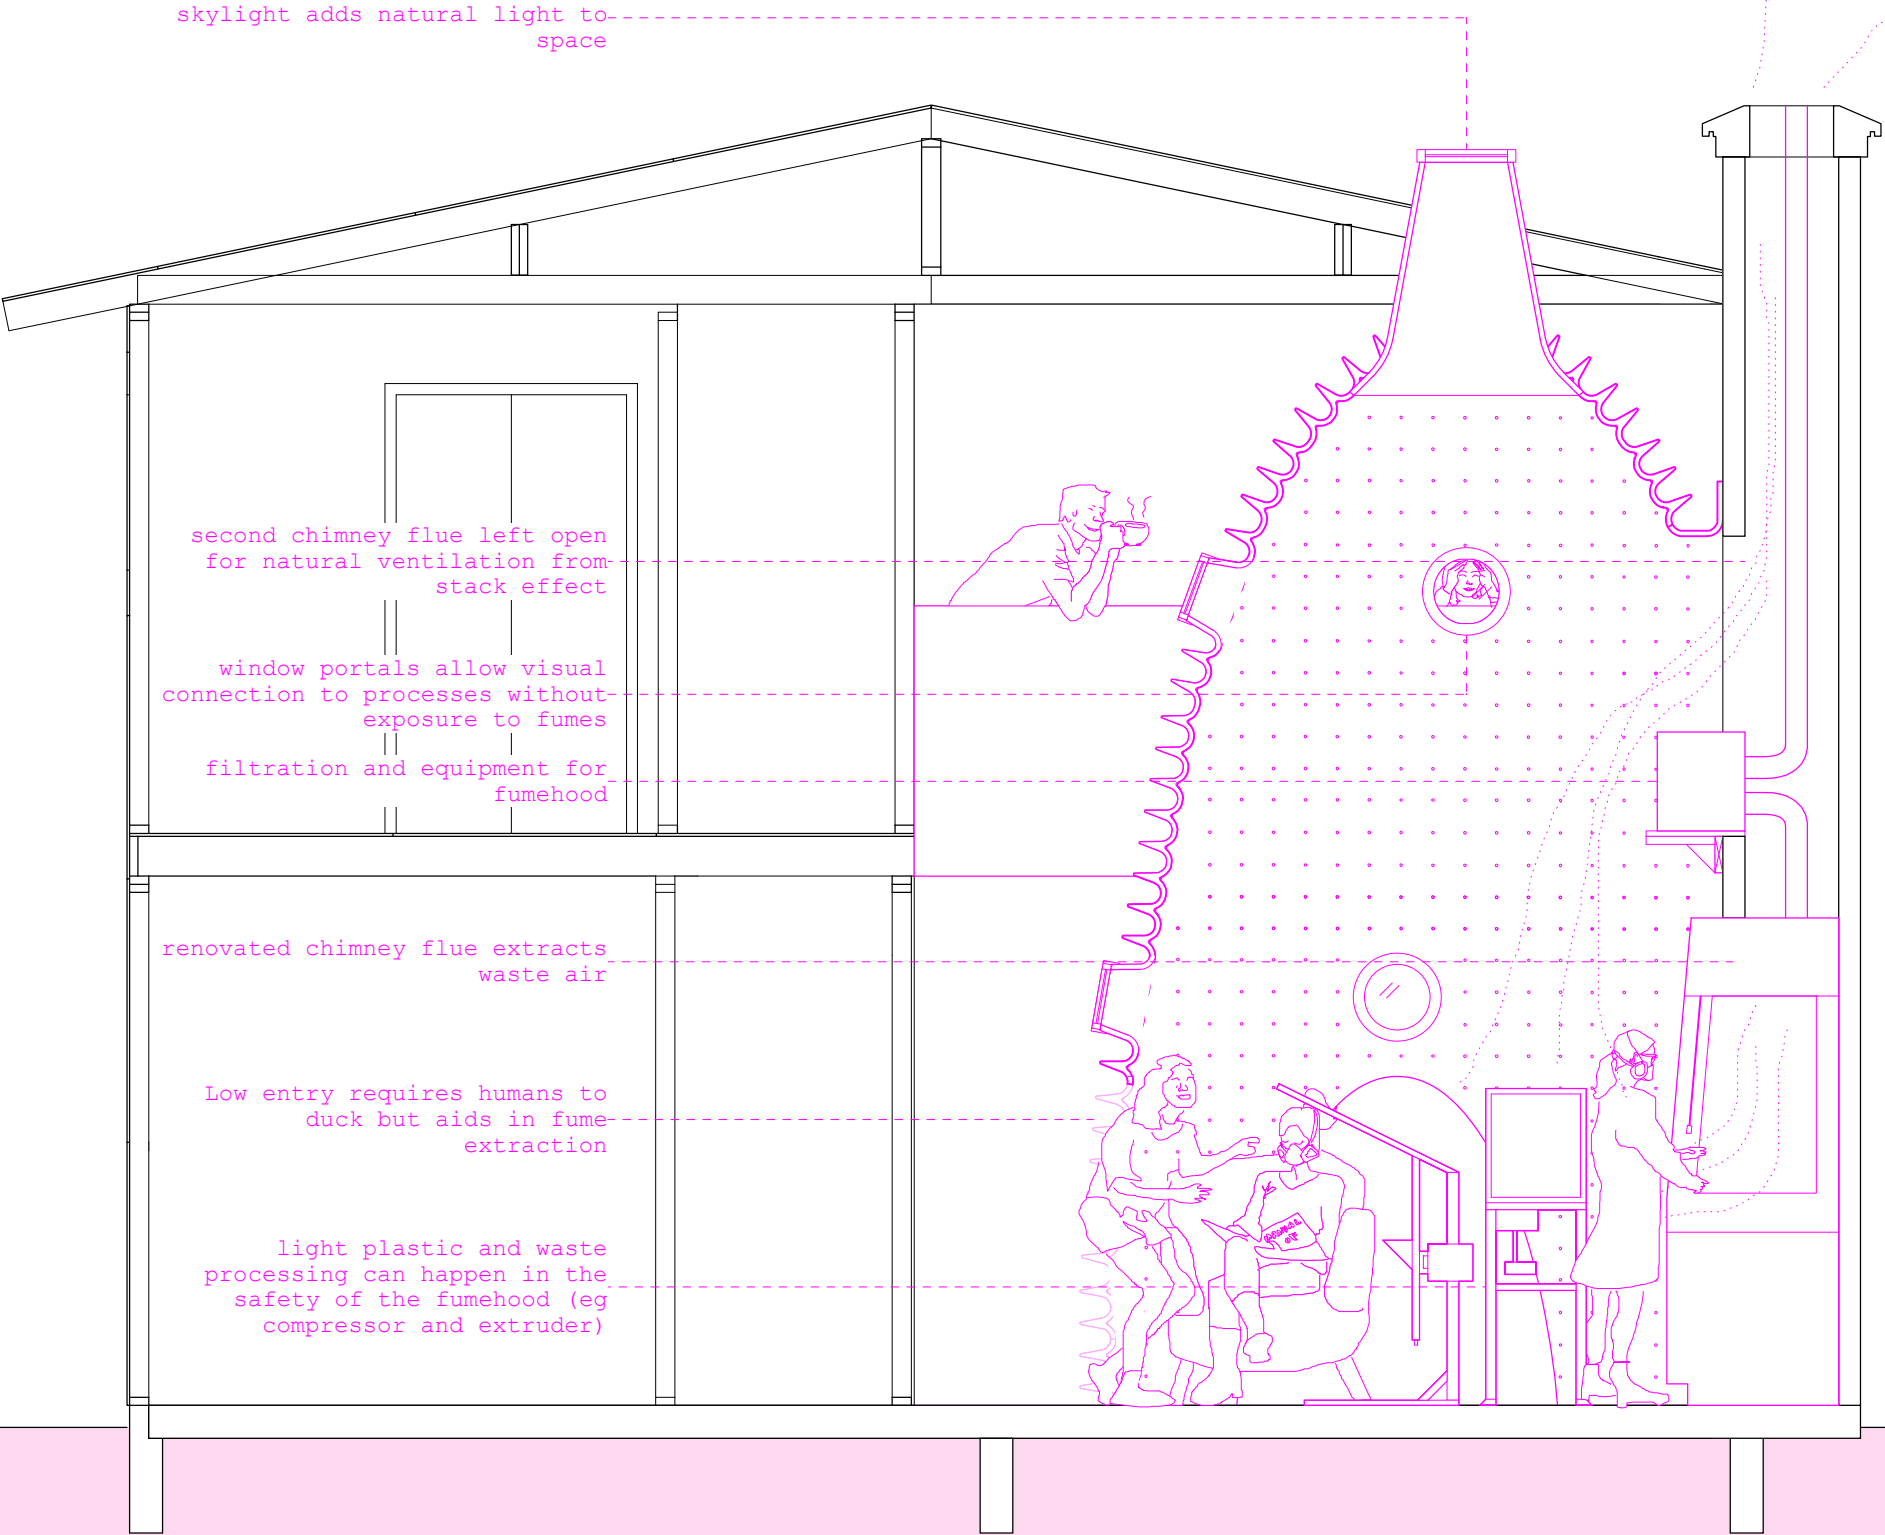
The Lung: Building Section: plastic recycling and a peepshow
